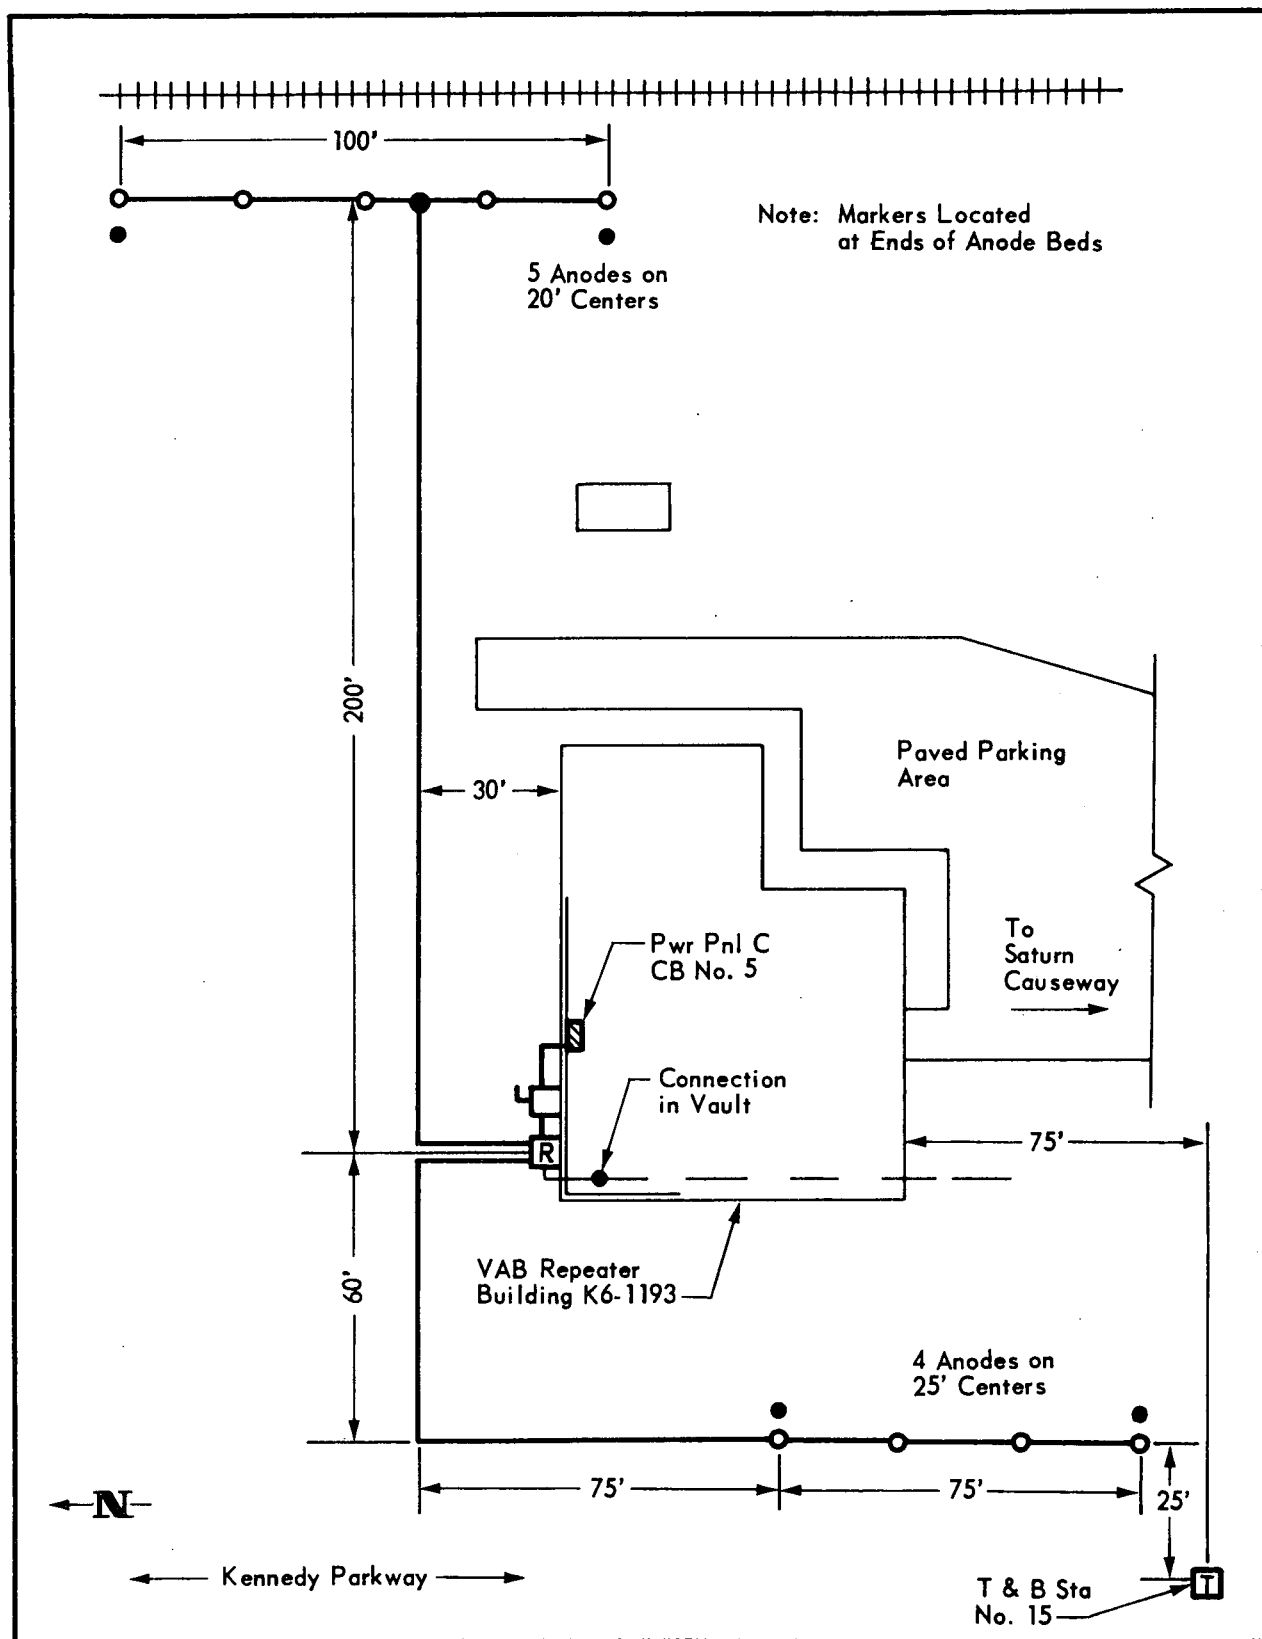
Site No. 5 and Test and Bond Station No. 15
